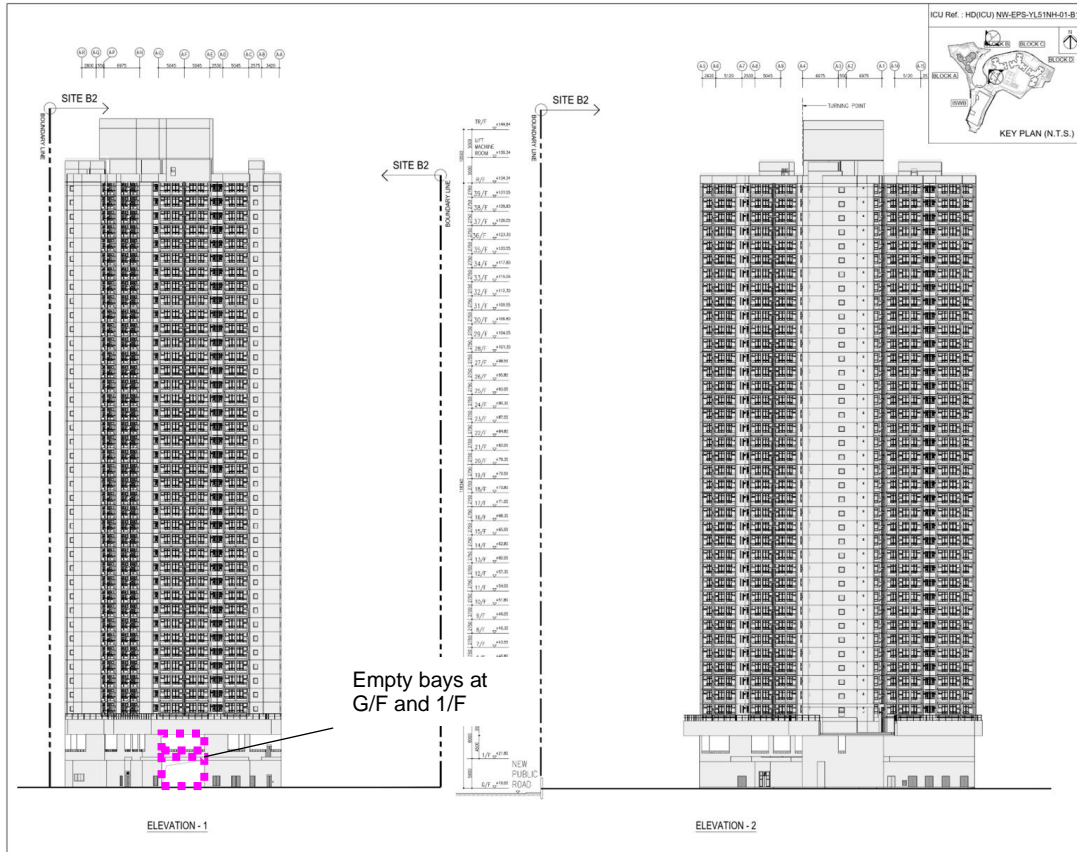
Layout Plan of Proposed Scheme at Site B (Section)
